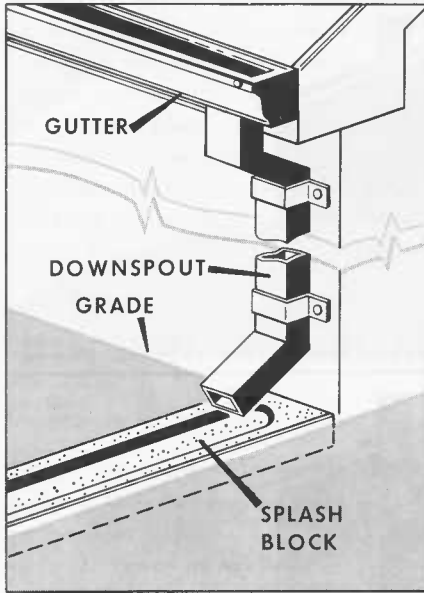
Correctly installed gutters and down-spouts prevent roof water from forming wet or damp conditions around basement walls.
